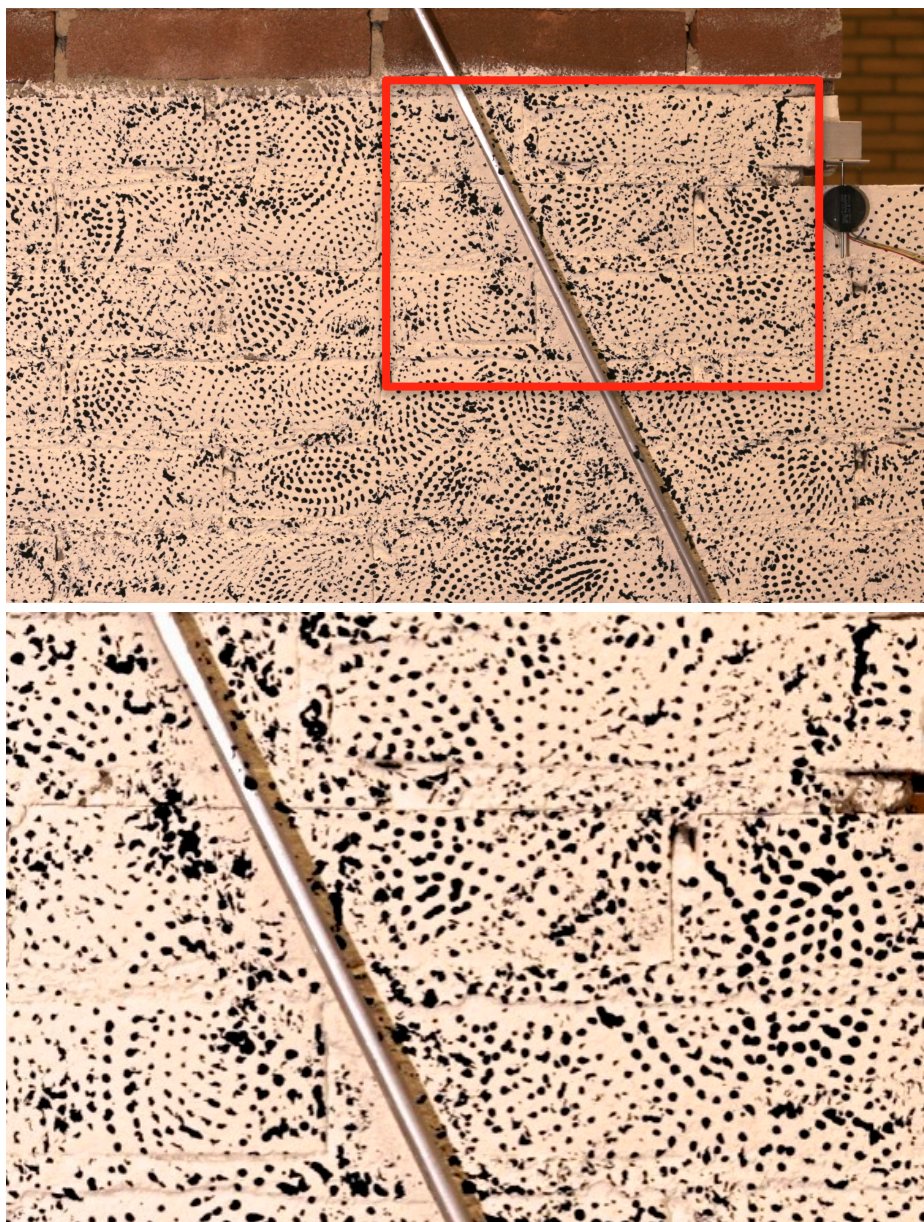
Top: back side of the wall at bottom right corner of window (when in front view). Bottom: zoomed in section on crack, location marked by red rectangle.
